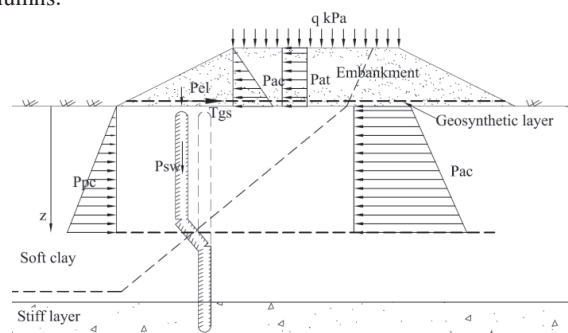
Load distribution over columns for embankment in consideration for the bending failure analysis.
